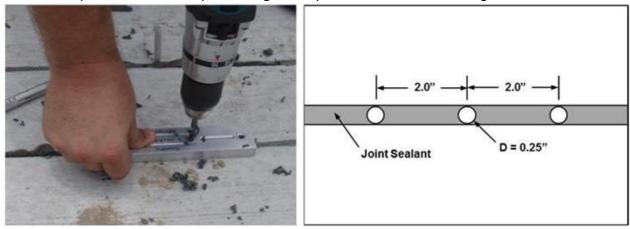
Drill three 1/4 inch diameter holes spaced 2 inches apart.
